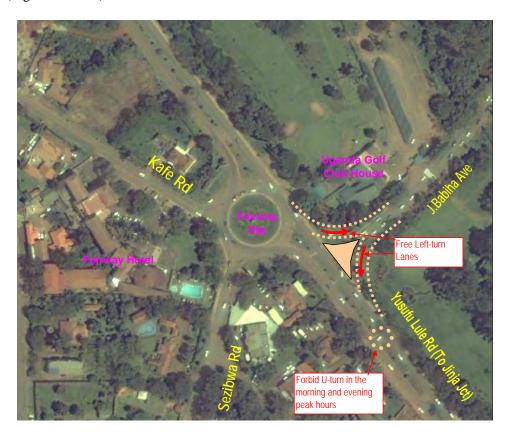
Alternative 2: Medium Term Improvement Plan for Fairway Roundabout
